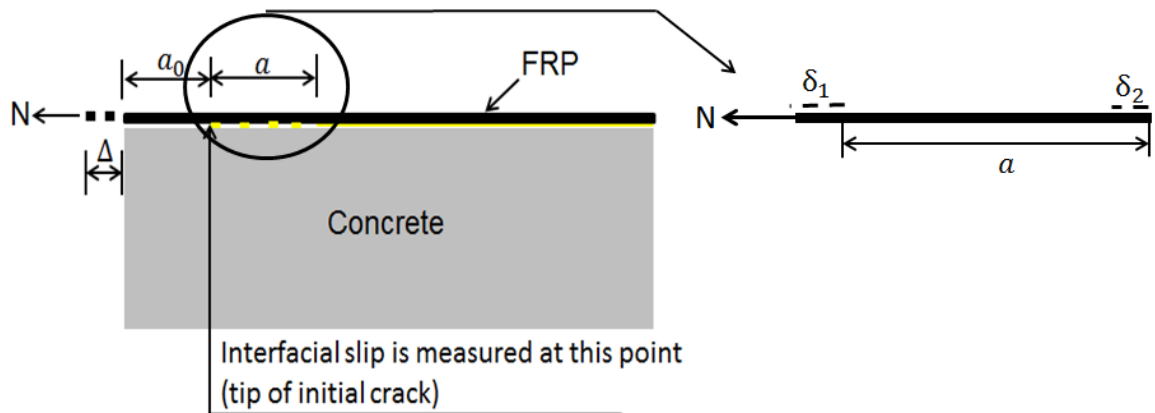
FRP-bonded concrete joint under pullout (Mode II) force
